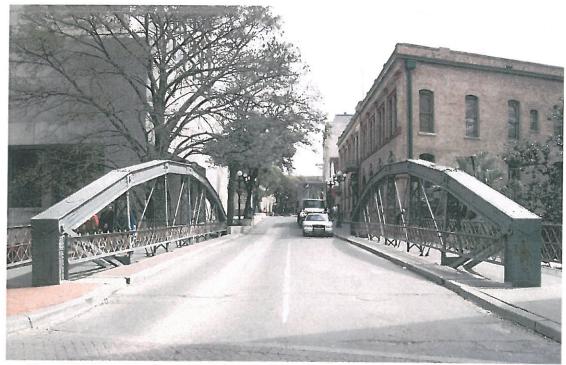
Crockett Bridge Section (Looking East toward Losoya St.)
